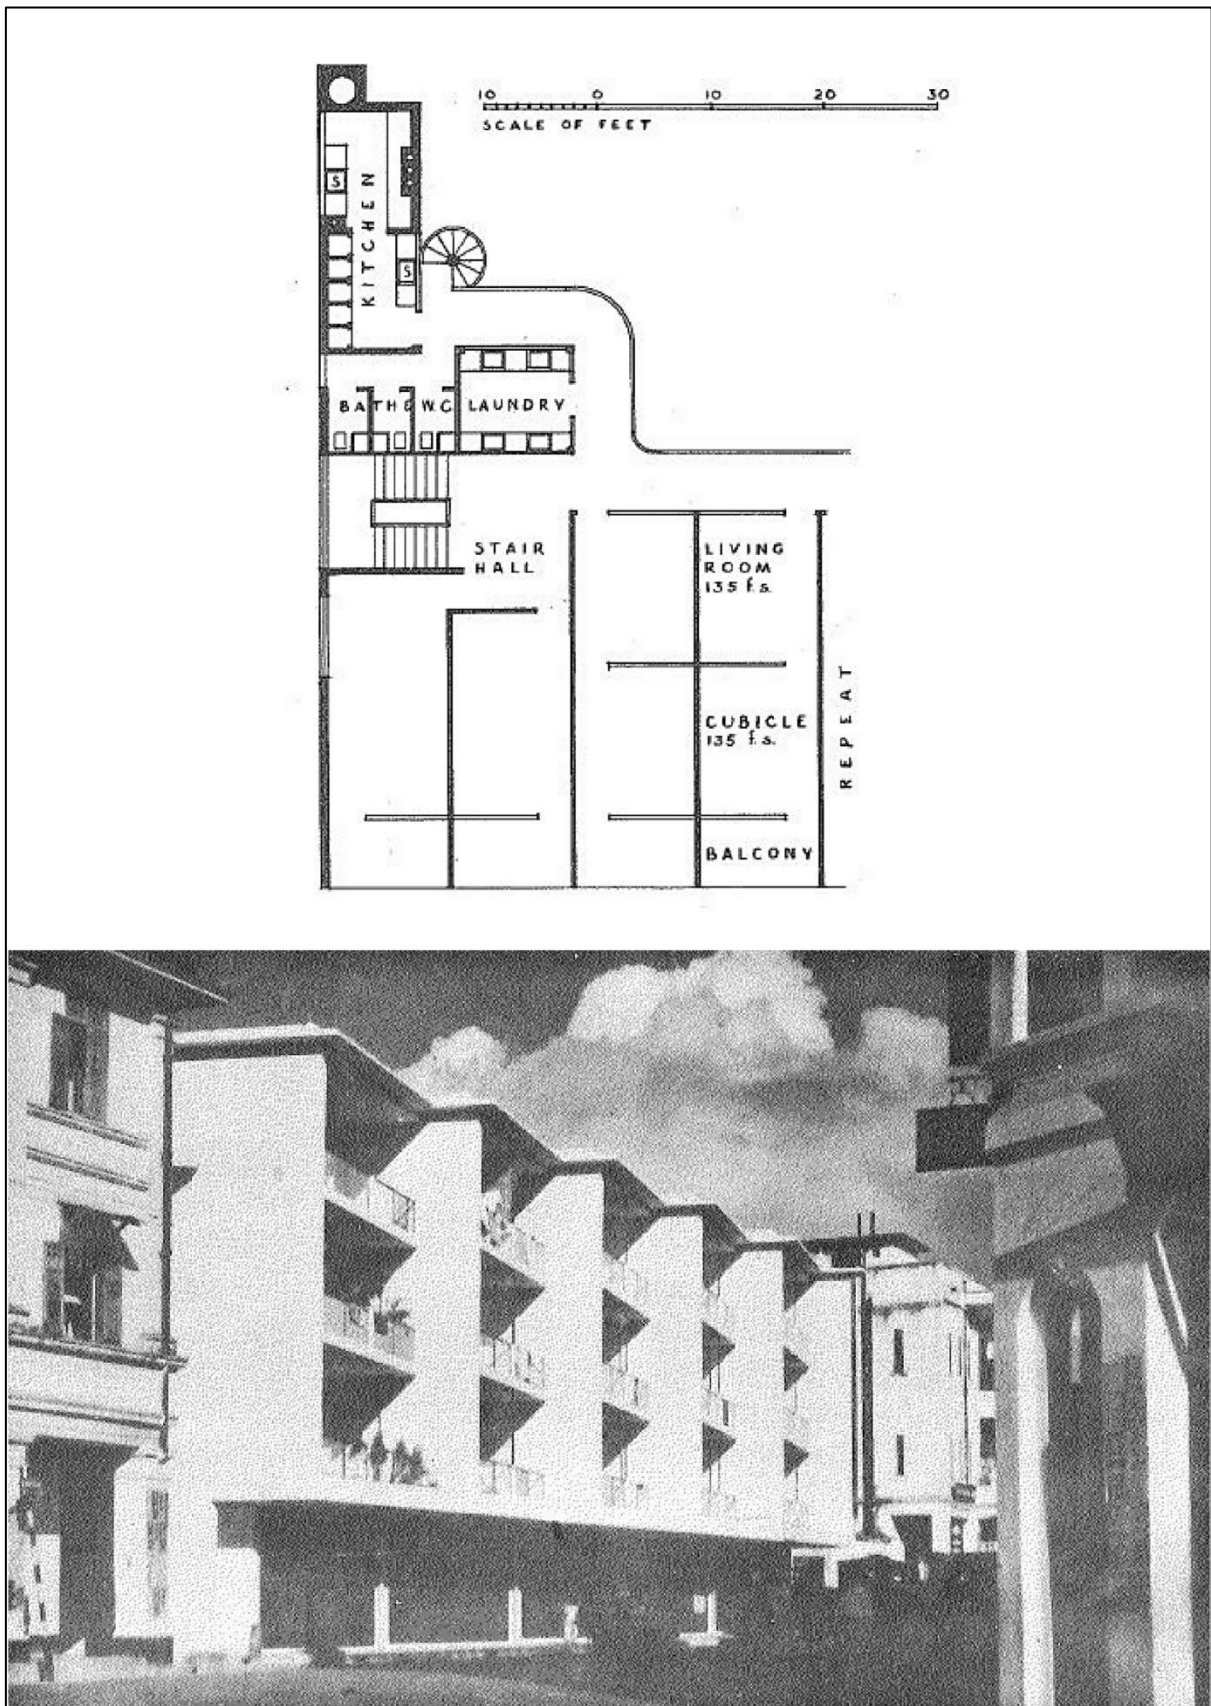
Colonial tenement housing – Floor plan and exterior view of tenements and shops on Albert Street in Singapore built between 1948-49; source: The Colonial Building Notes (1950).
